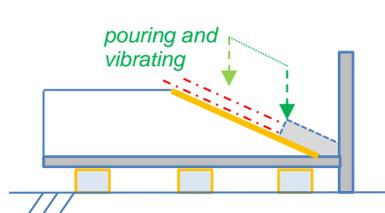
Without upper form; concrete pouring and compaction possible over entire wall
